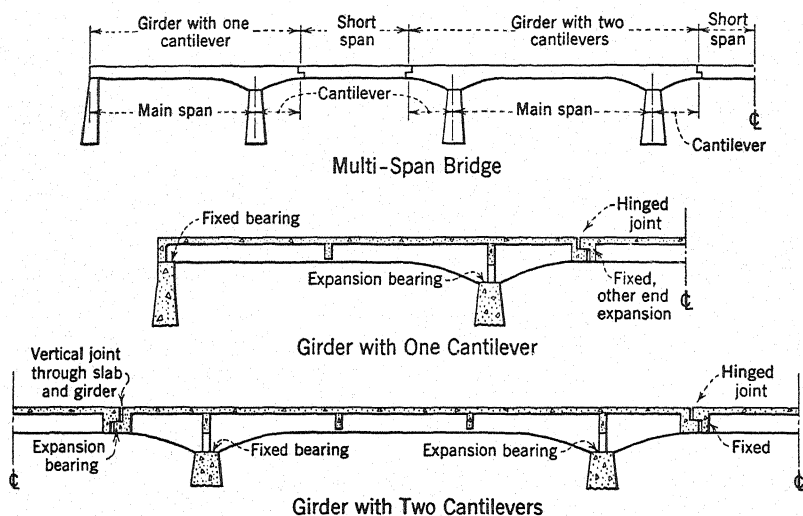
Combination of Girders with Cantilevers and Short Suspended Spans.
